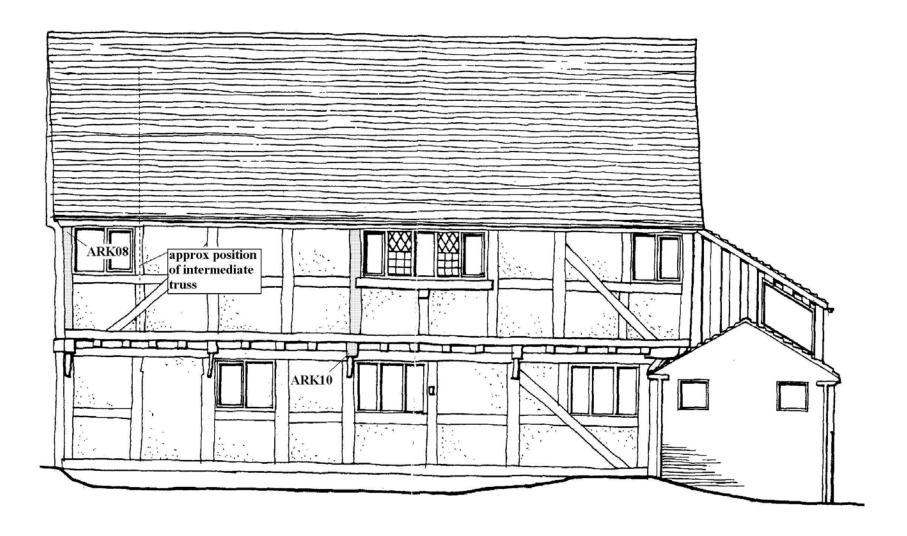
North elevation of Church House, showing timbers sampled for dendrochronology. Adapted from drawings supplied by Anna Deeks.
